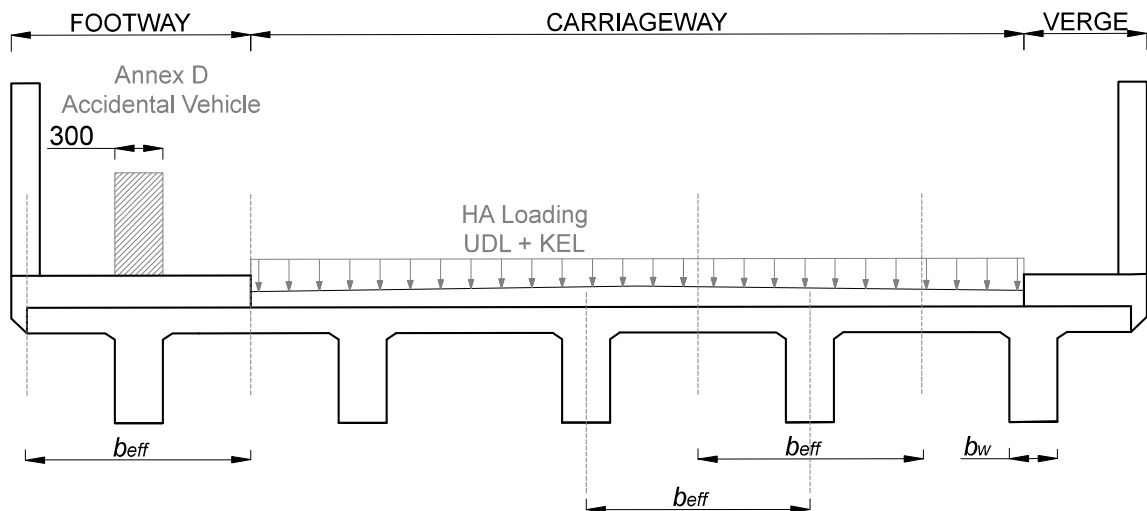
Bridge section showing applied loading and effective width for load application [mm].
